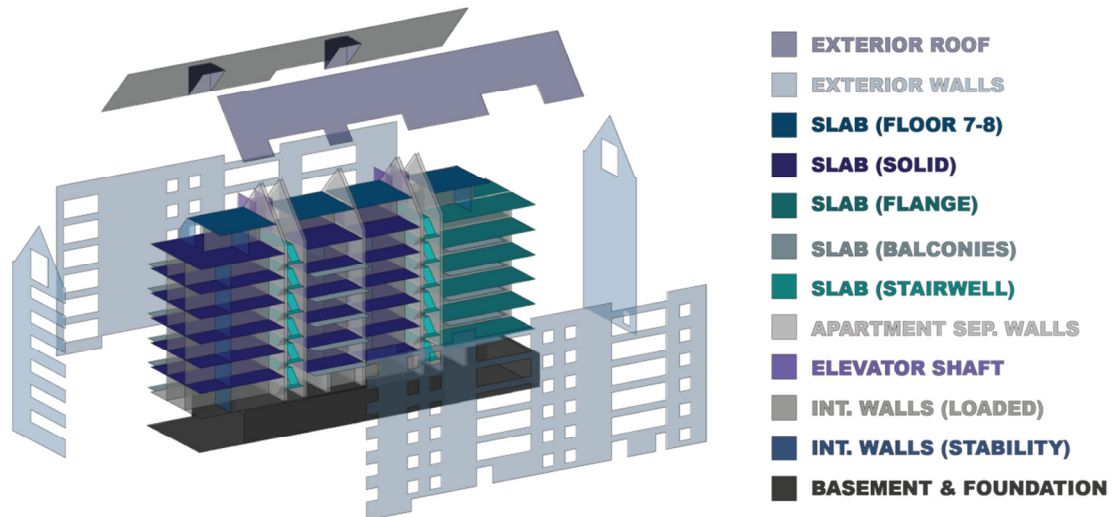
Area modelling of multi-residential buildings based on construction drawings.
